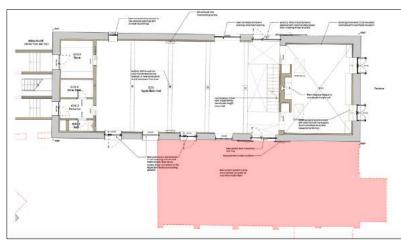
Apple Barn, proposed ground-floor plan; location of Concrete Barn proposed for demolition.
